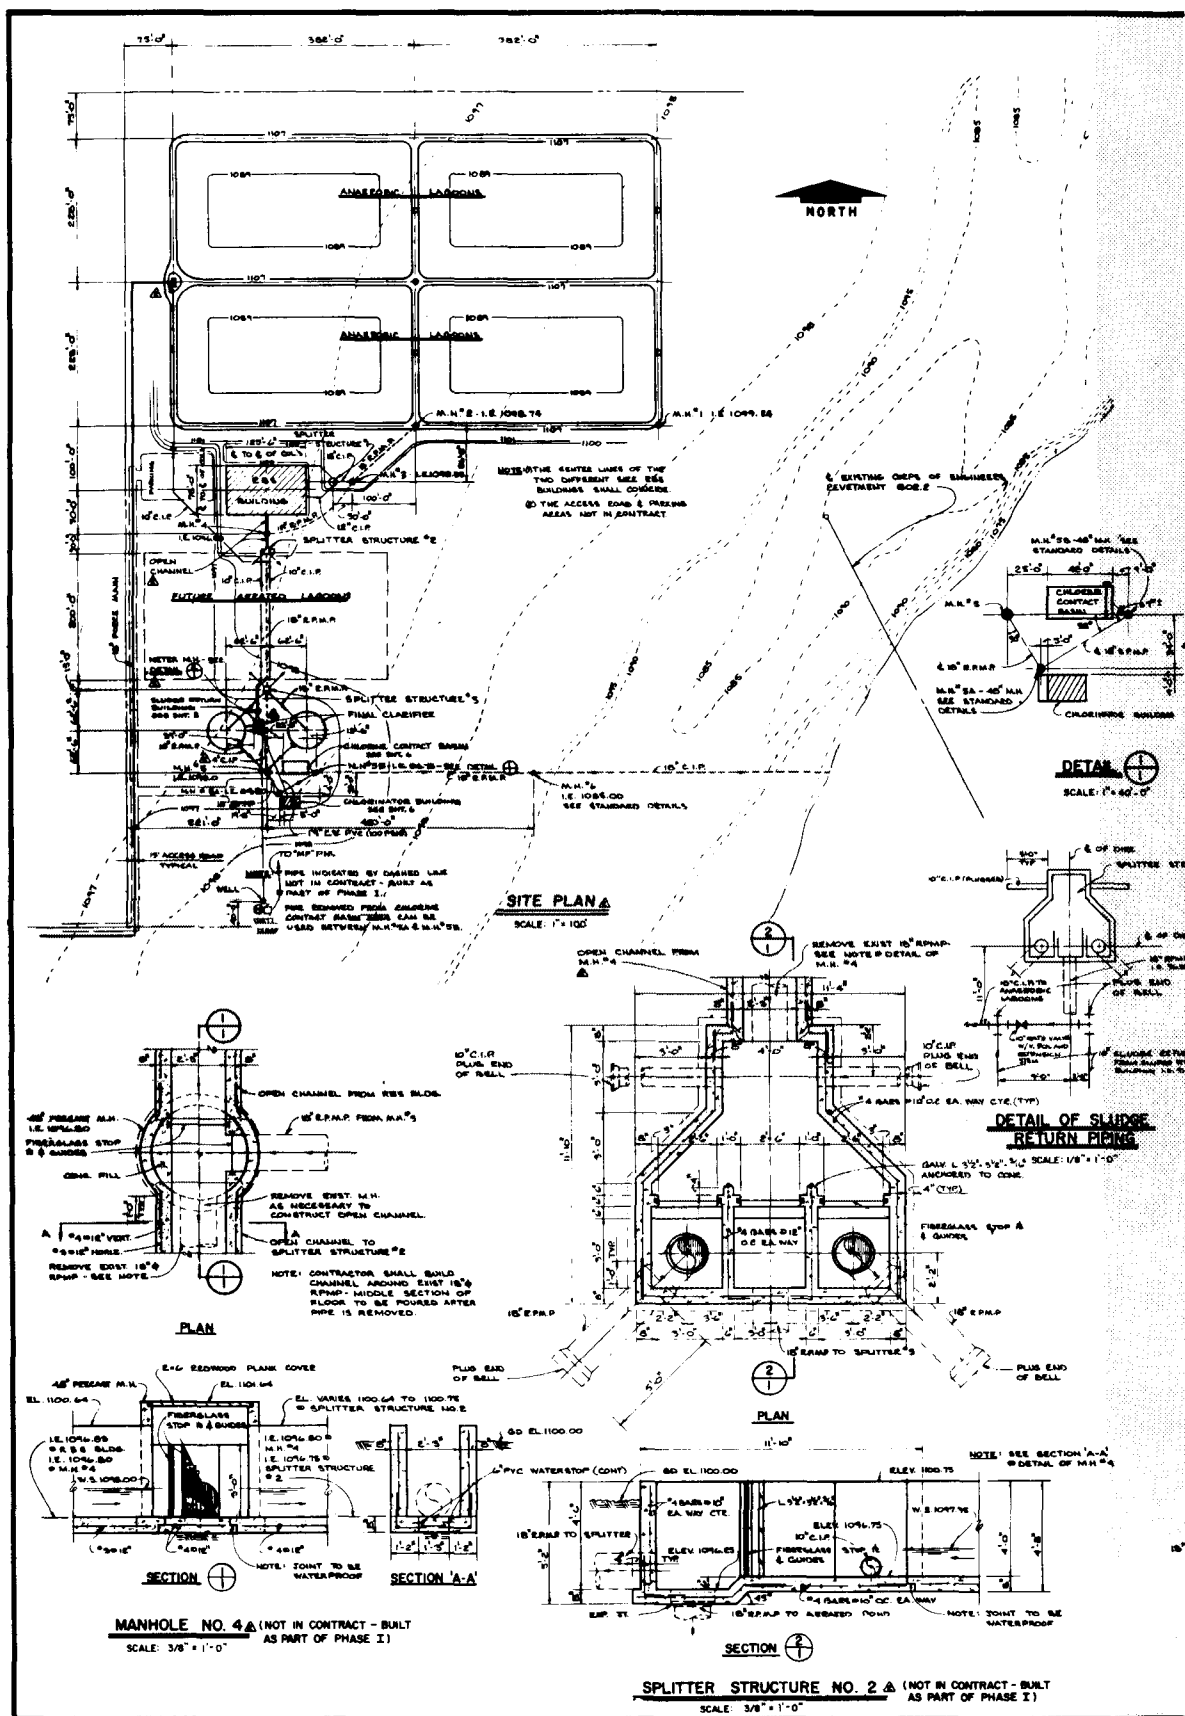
Waste-treatment facilities site plan, Iowa Beef Processors, Inc., Dakota City.
